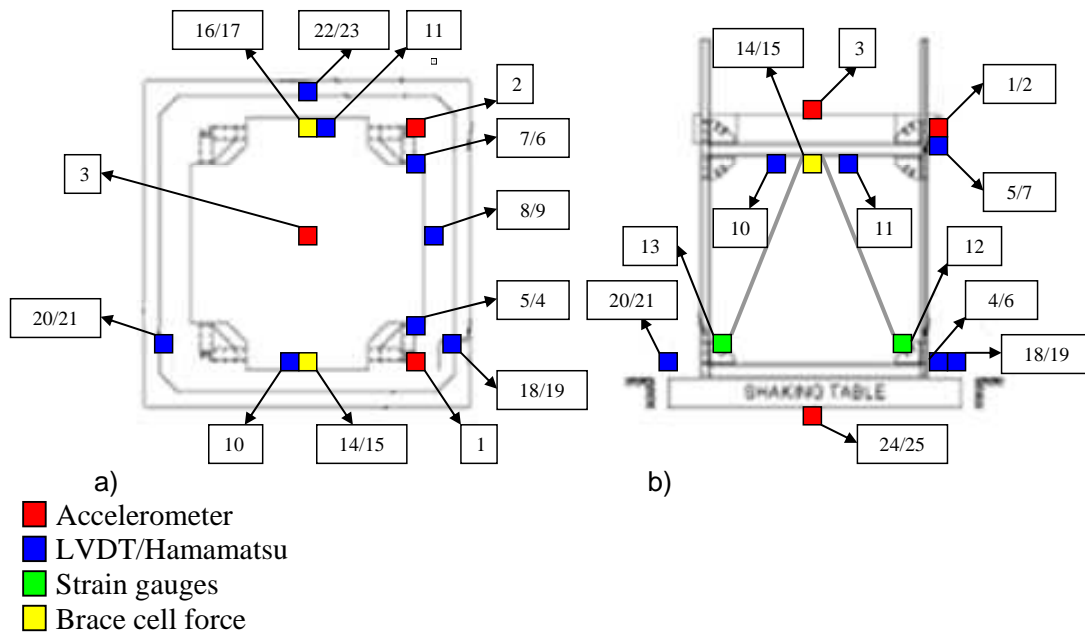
Instrumentation set-up of the SPECIMEN II and III at LNEC shaking table: a) Plan View and b) elevation.
